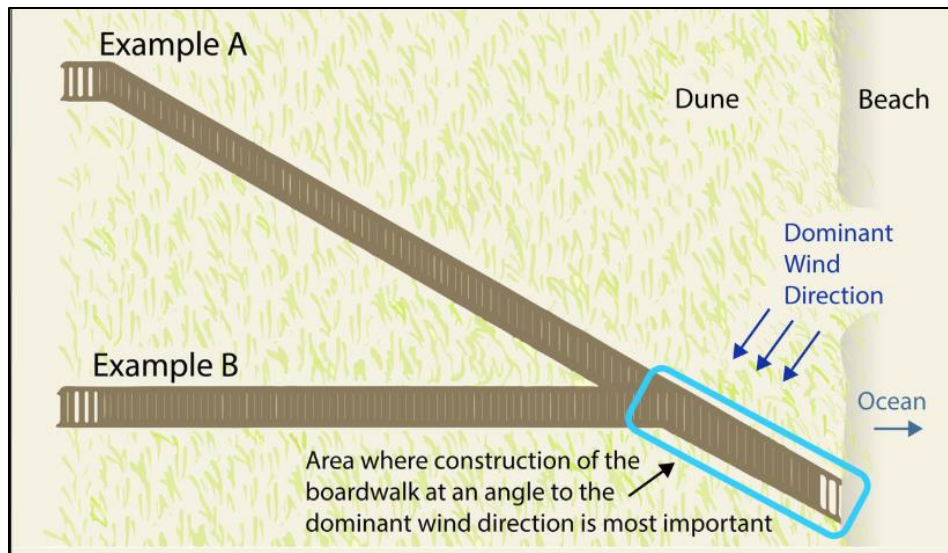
A recommended approach is to construct the walkway at an angle away from the dominant wind and wave direction. Retrieved from MA CZM Basics of Building Beach Access Structures that Protect Dunes and Banks
